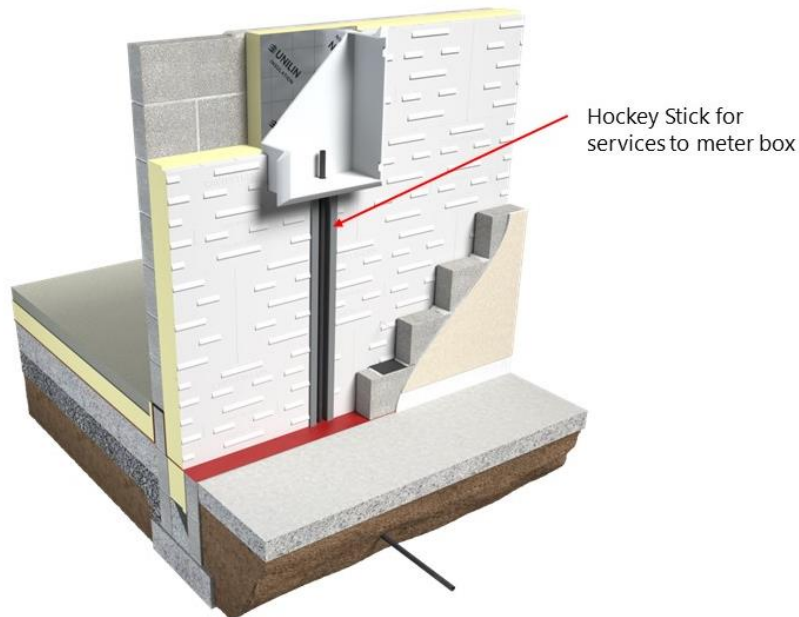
Unilin CavityTherm Hockey Stick & Meter Box Board Installation Detail
